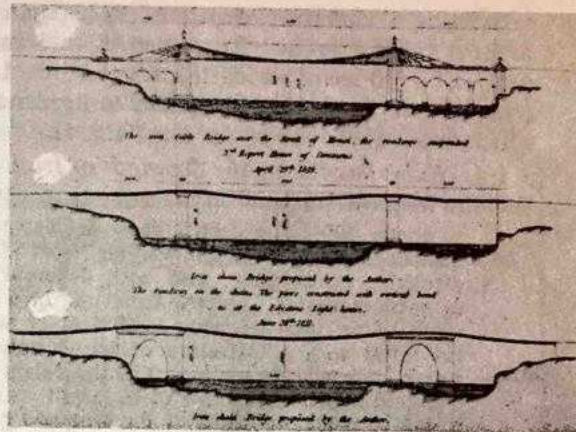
Menai Bridge proposals - Ware's 1811 elevation (centre), alternative (bottom) and Telford's 1818-19 elevation (Top). [32].
